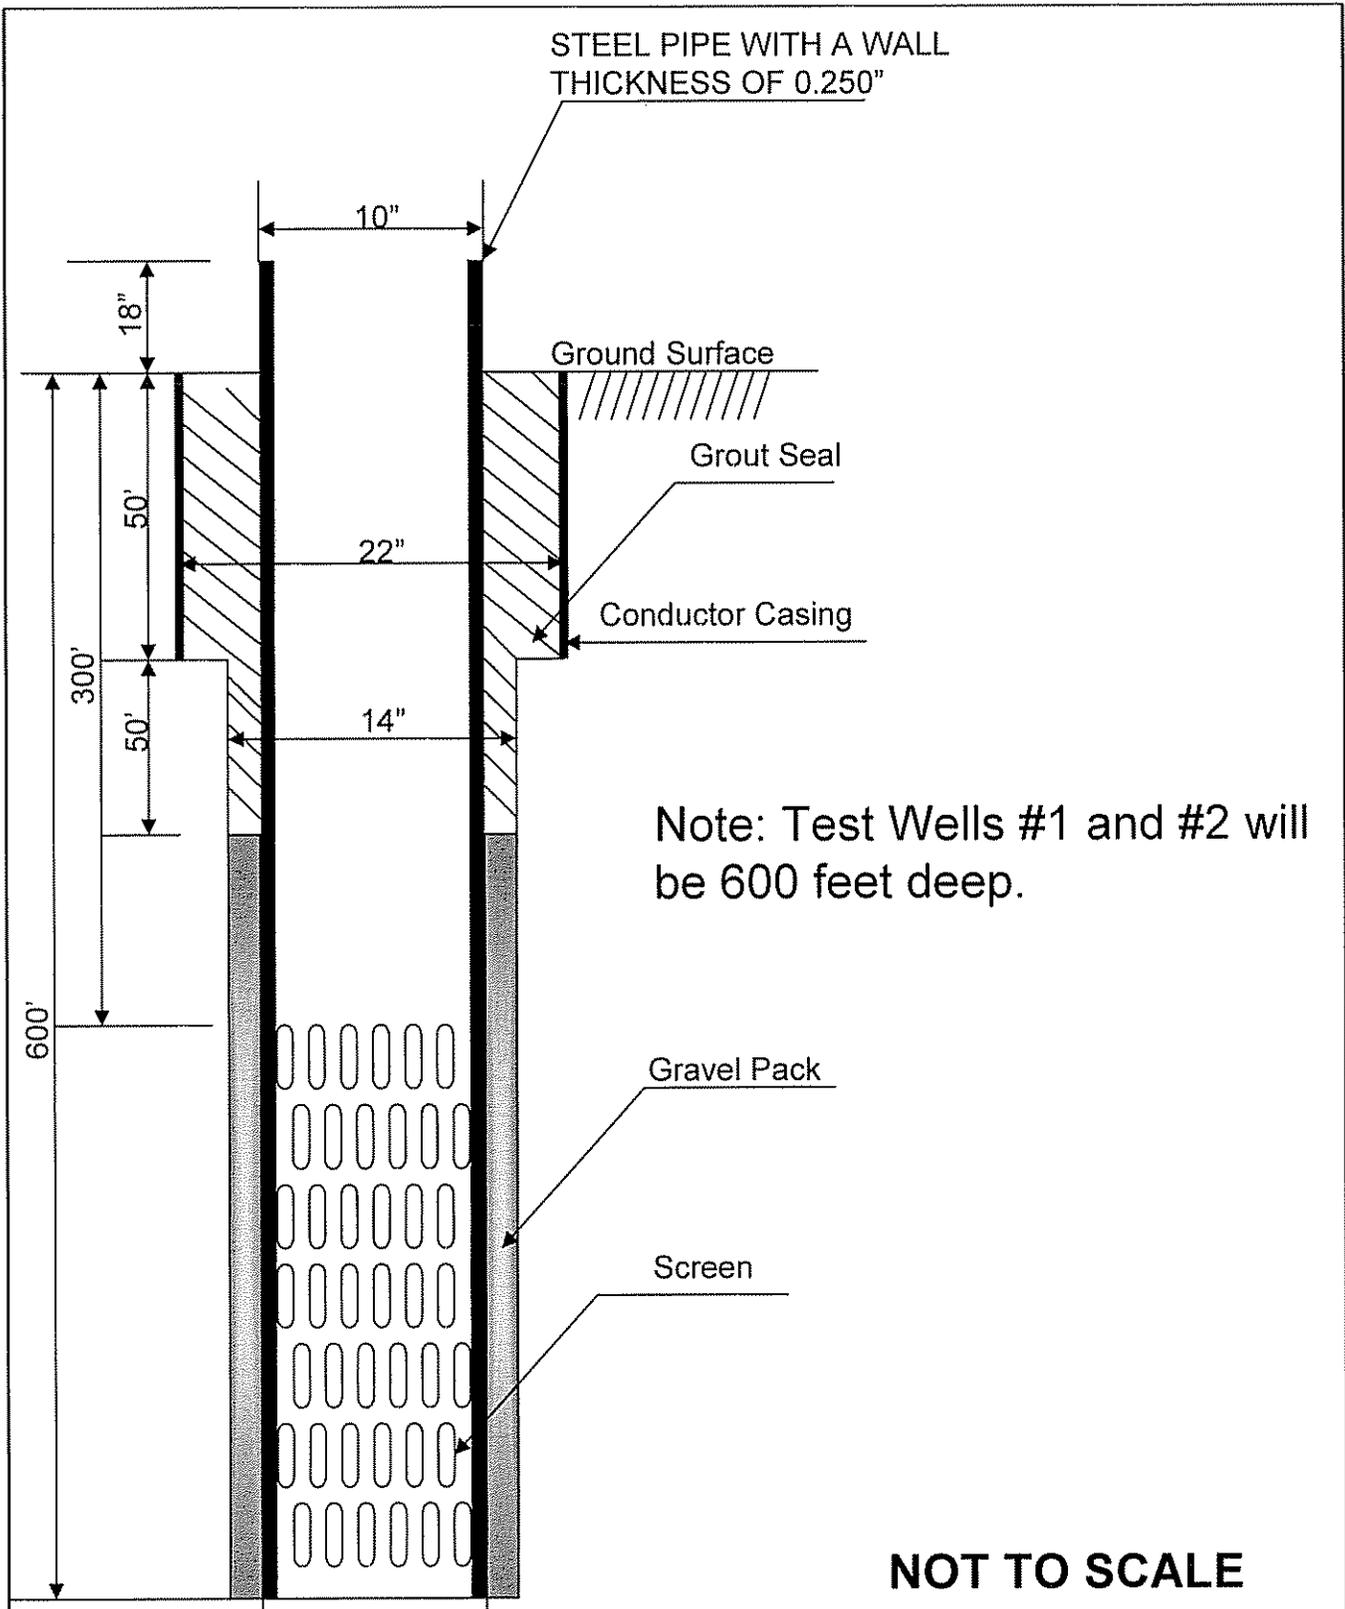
WELL DESIGN – ROTARY DRILLING METHOD
